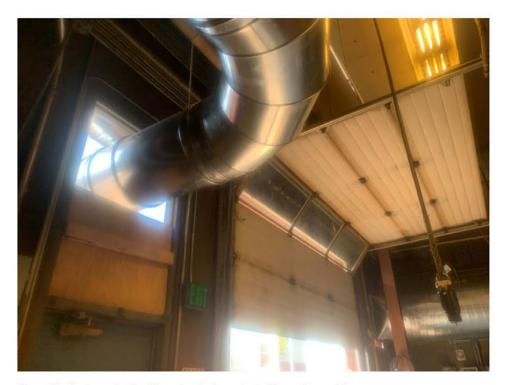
Duct penetration through exterior wall. Flashing not complete.
